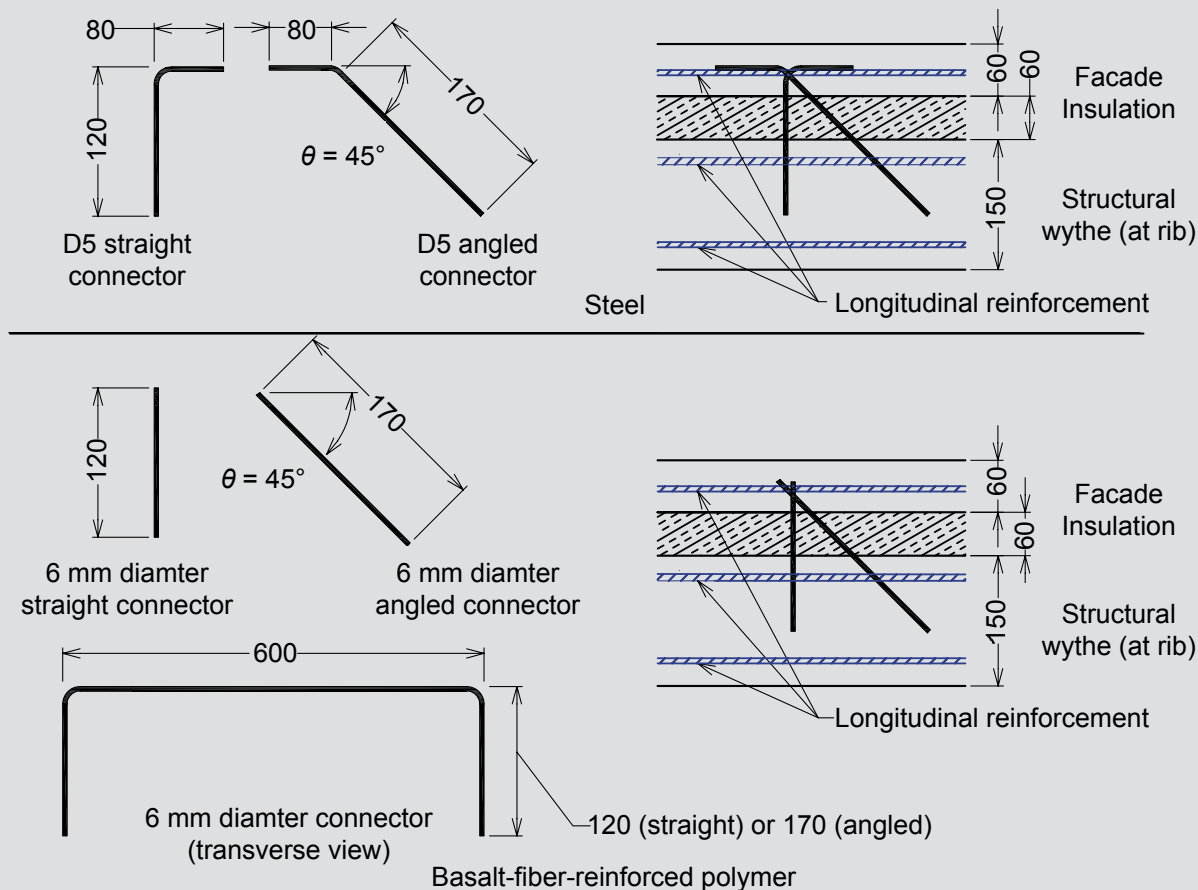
Dimensions and layout of shear connector pair. Note: All dimensions are in millimeters. 1 mm = 0.0394 in.
